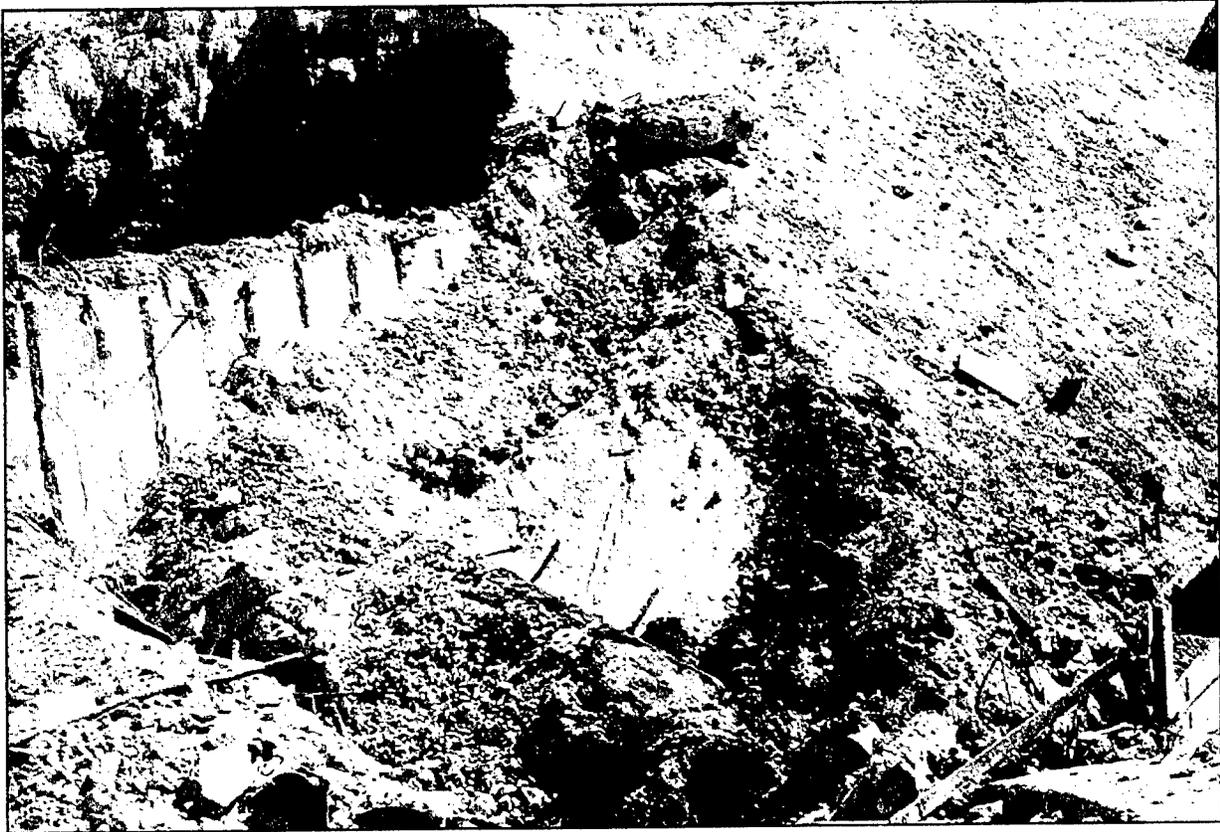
Poured, reinforced concrete square outer retaining wall exposed in silo crater. Derzhavinsk, Regiment 5, Silo 4.
